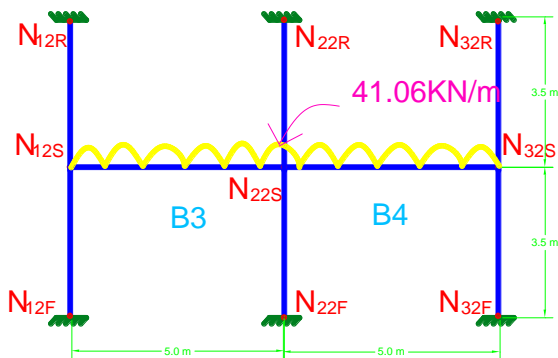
Substitute Frame -2 for the Second Floor Beam B3 - B4 (SSF2)
